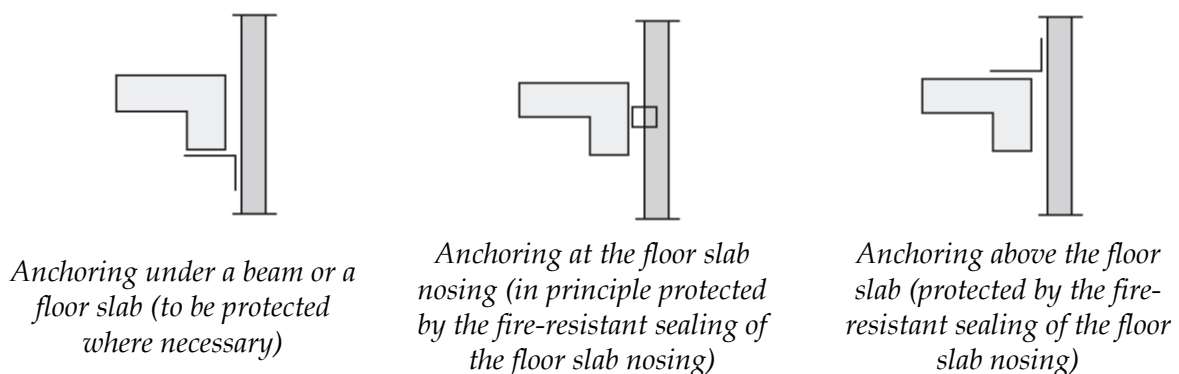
Diagram illustrating the position of the frame fixing anchors.
